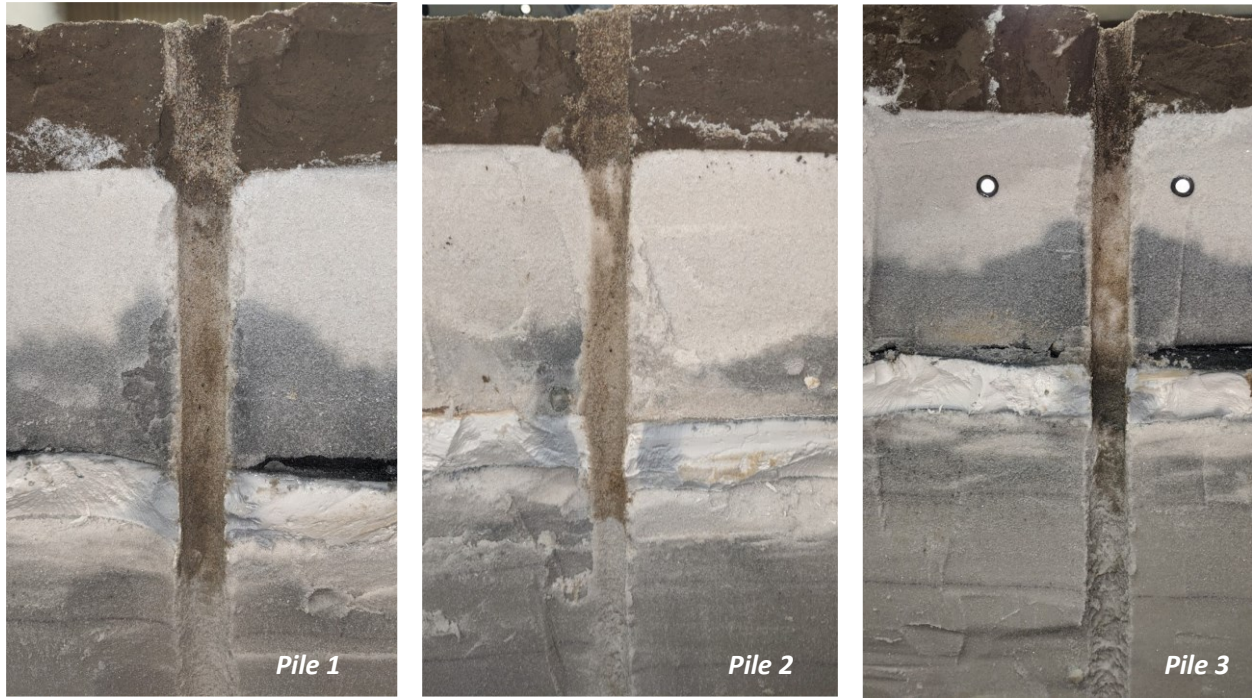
Cross-section view of soil around Pile 1, Pile 2, and Pile 3 during the excavation process.
